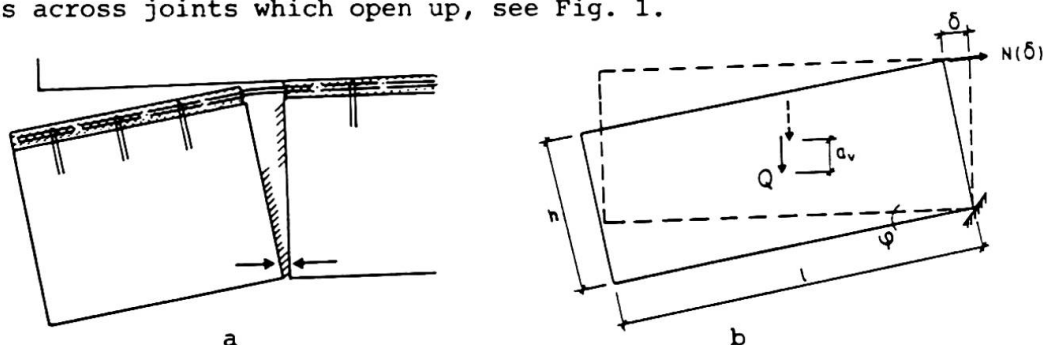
A wall panel forming an alternative load-bearing system by cantilever action at large plastic deformations of a tie connection
